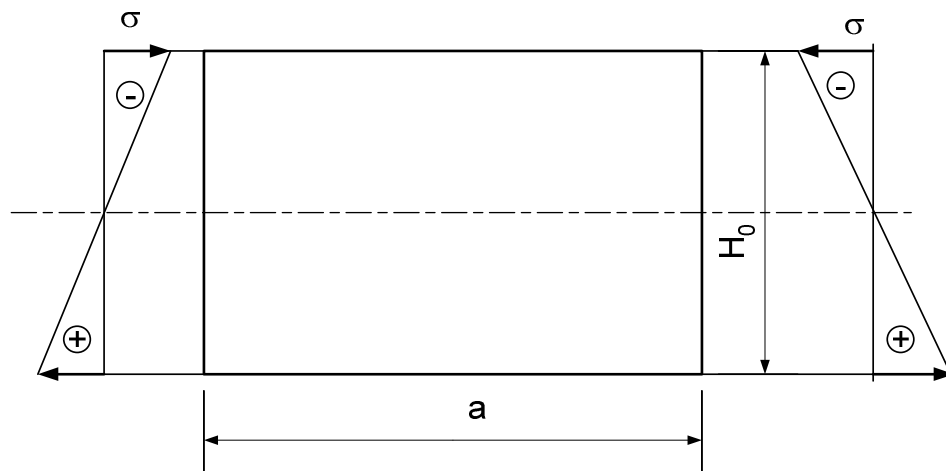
Diagram for checking the local stability of the main girder wall
